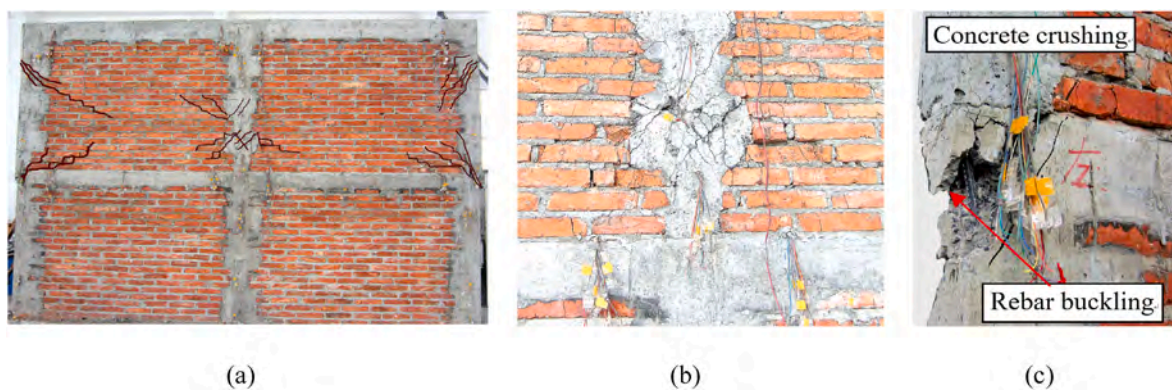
Failure modes of original masonry structure: (a) Primary cracks of W1; (b) diagonal cracks of middle tie-column in the 2nd floor; (c) concrete crushing and rebar buckling in the bottom of tie-column in the 2nd floor.
